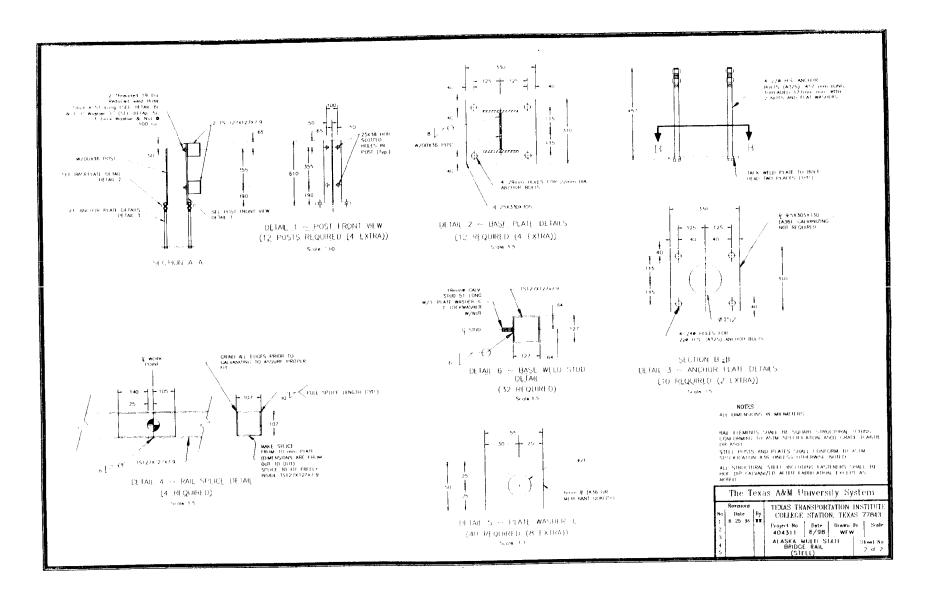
Details of the Alaska Multi-State Bridge Railing mounted on the curb (steel) (continued).
